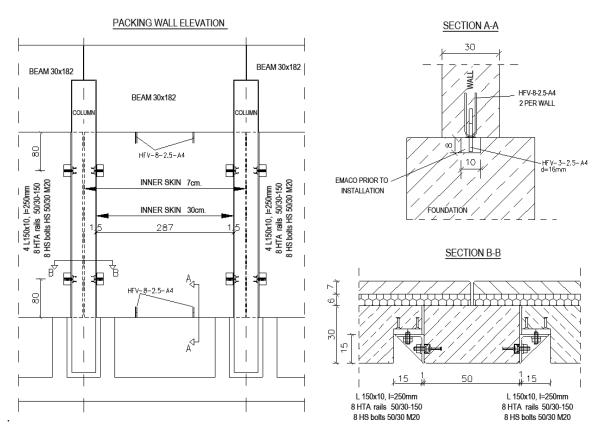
"Sandwich"-type wall: Connections of packing wall with strip footing and column
